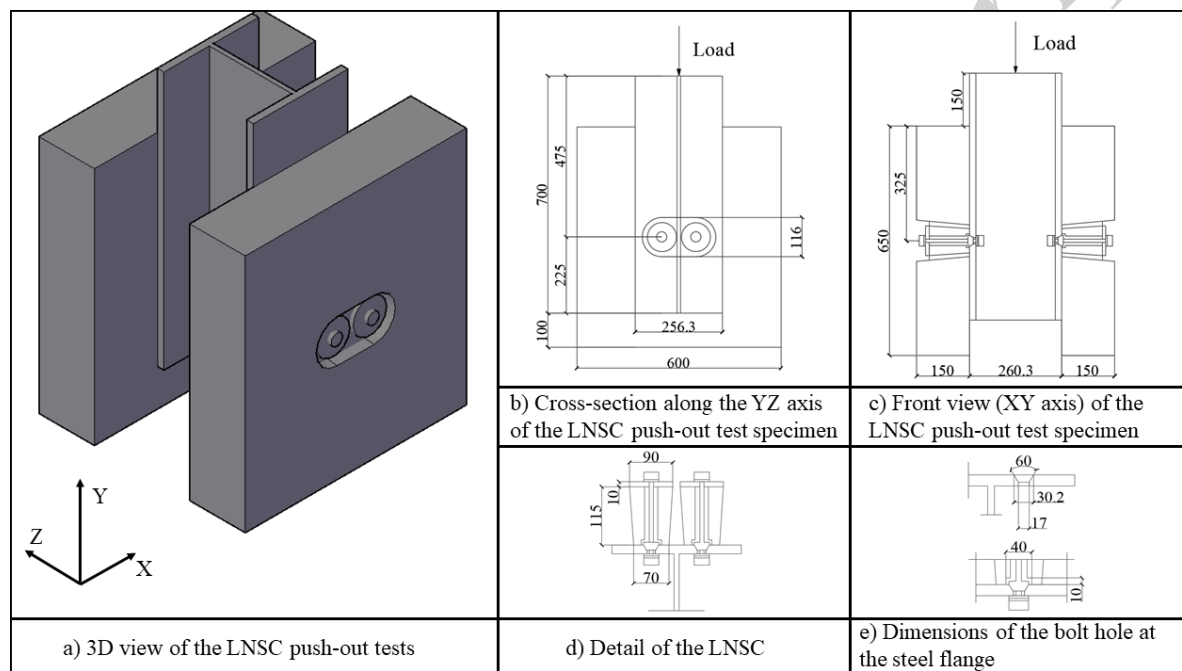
Details of the push-out specimens with LNSC connectors (Dimensions are given in mm).
